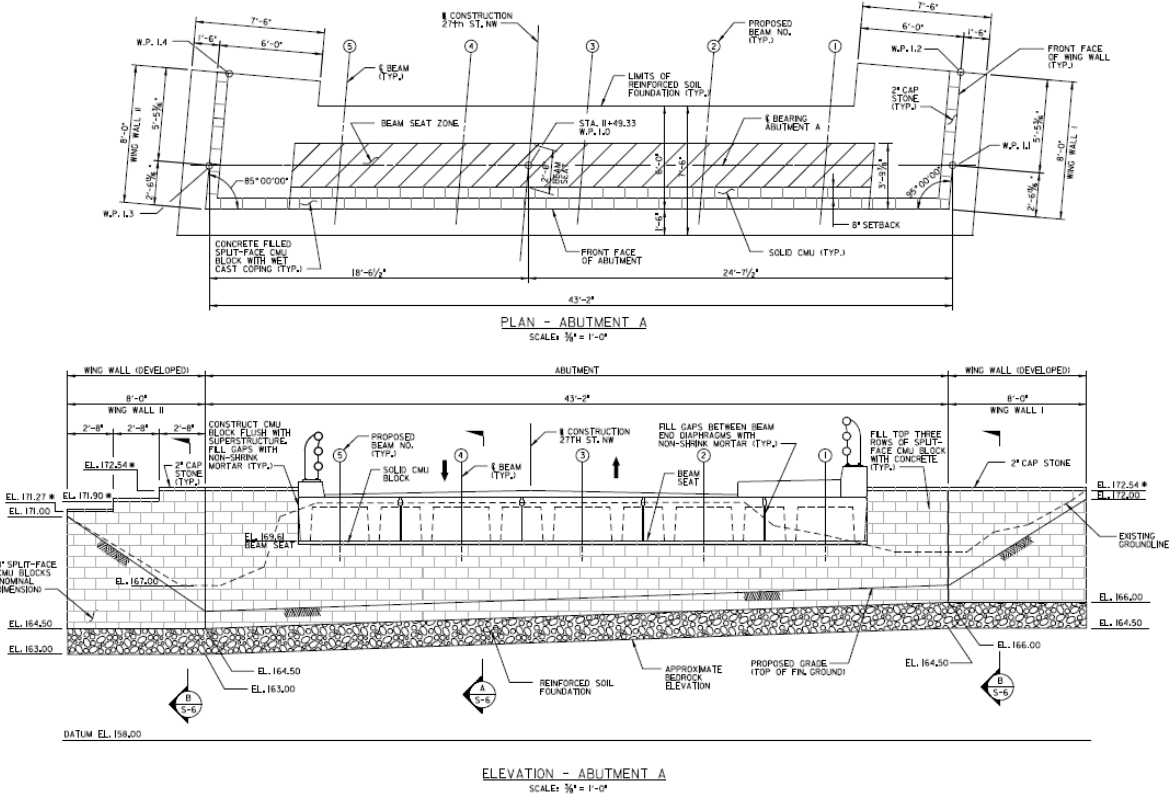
Diagram. Plan and elevation views of GRS abutment A.
